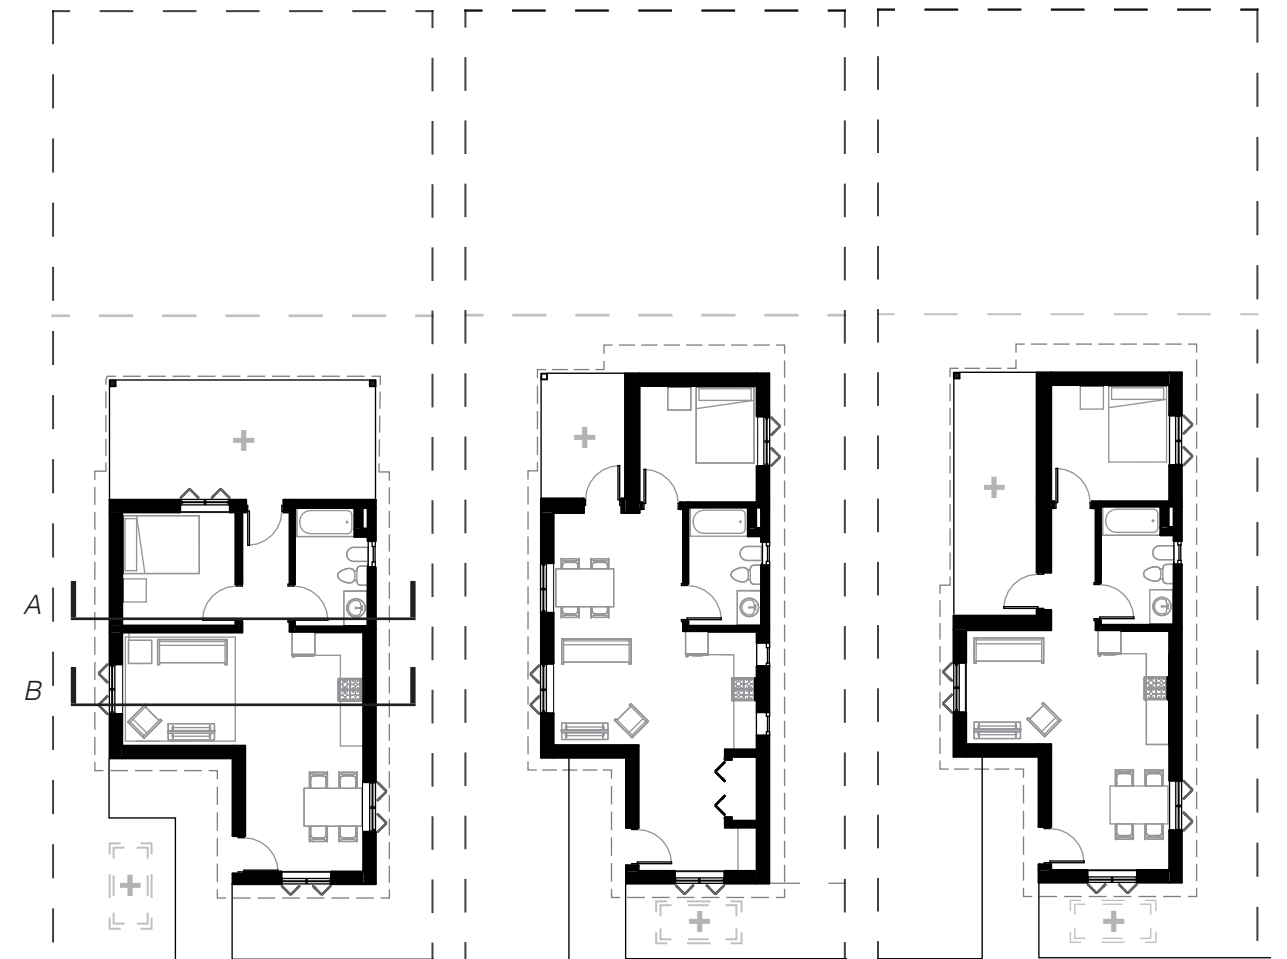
Typical (left) and alternative (right) plans at 1:200 (metric).
